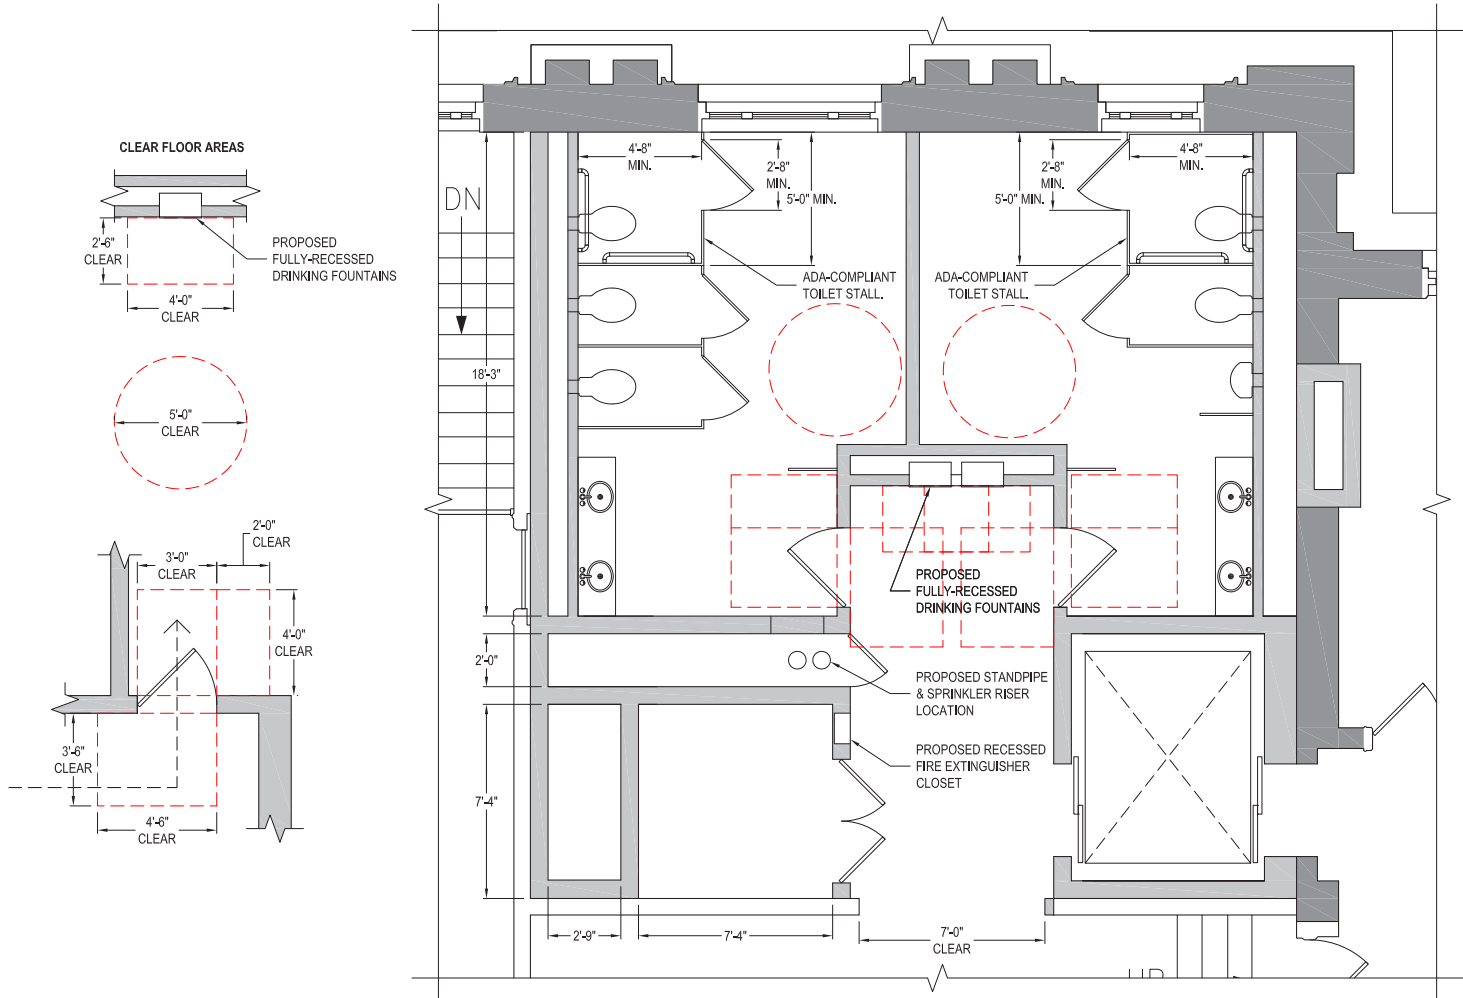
This Layout Illustrates a Typical Concept Plan for the Service Core Areas. Pages 7.18 - 7.25 present the specific variations for each floor and side of the building [East / West].
